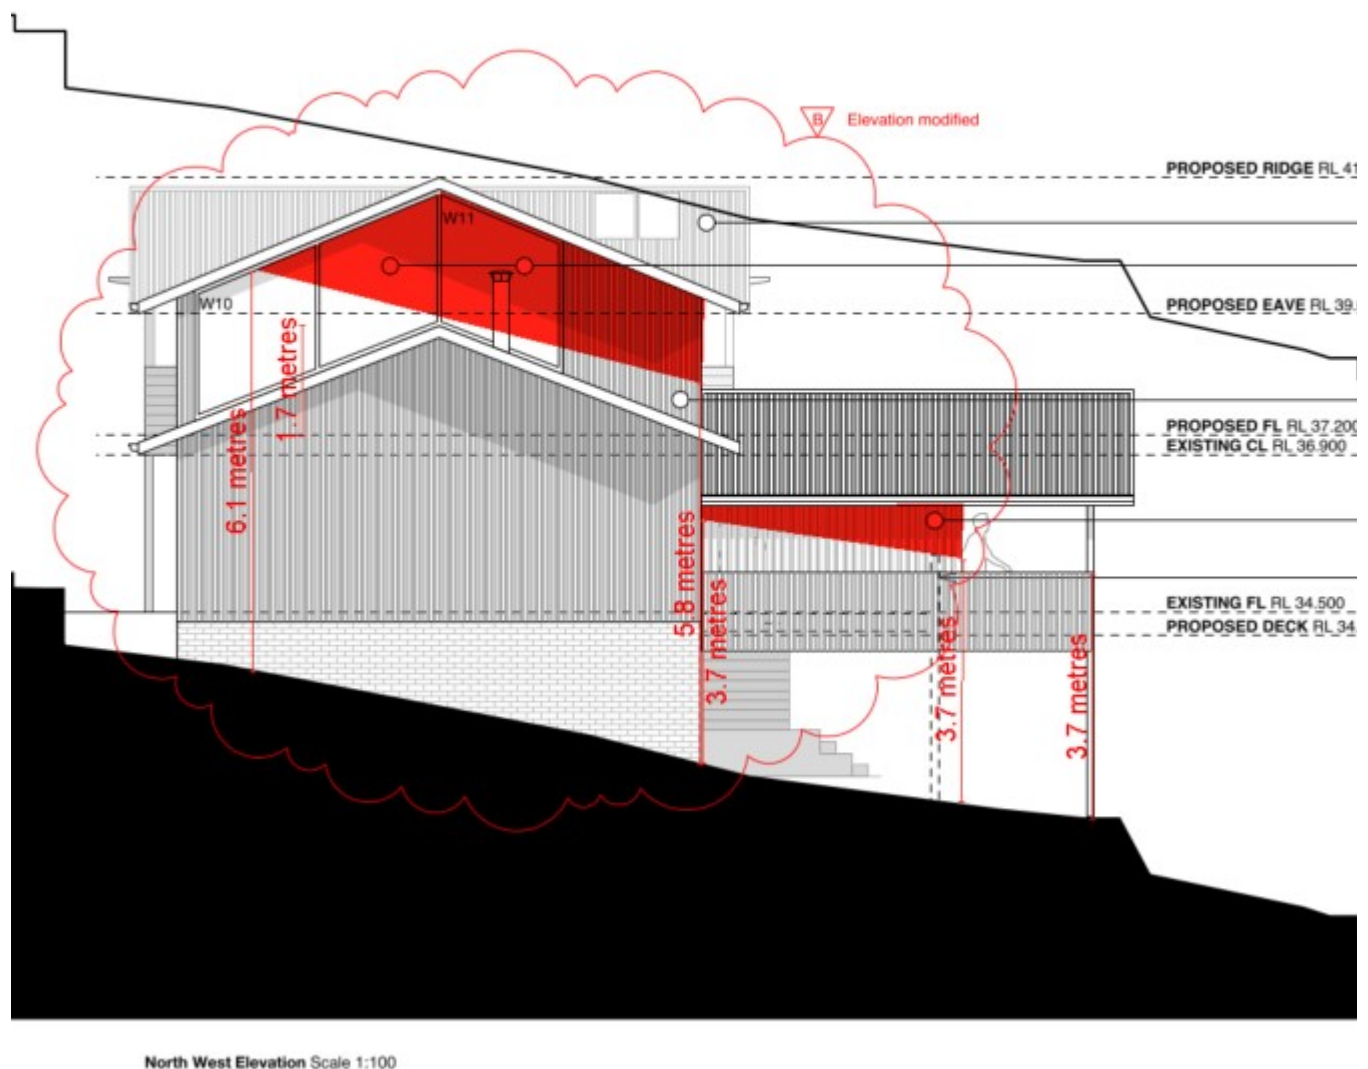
Extent of non-compliance north-western elevation. Source, Laura Cook Architecture (red mark up by Council officer).
